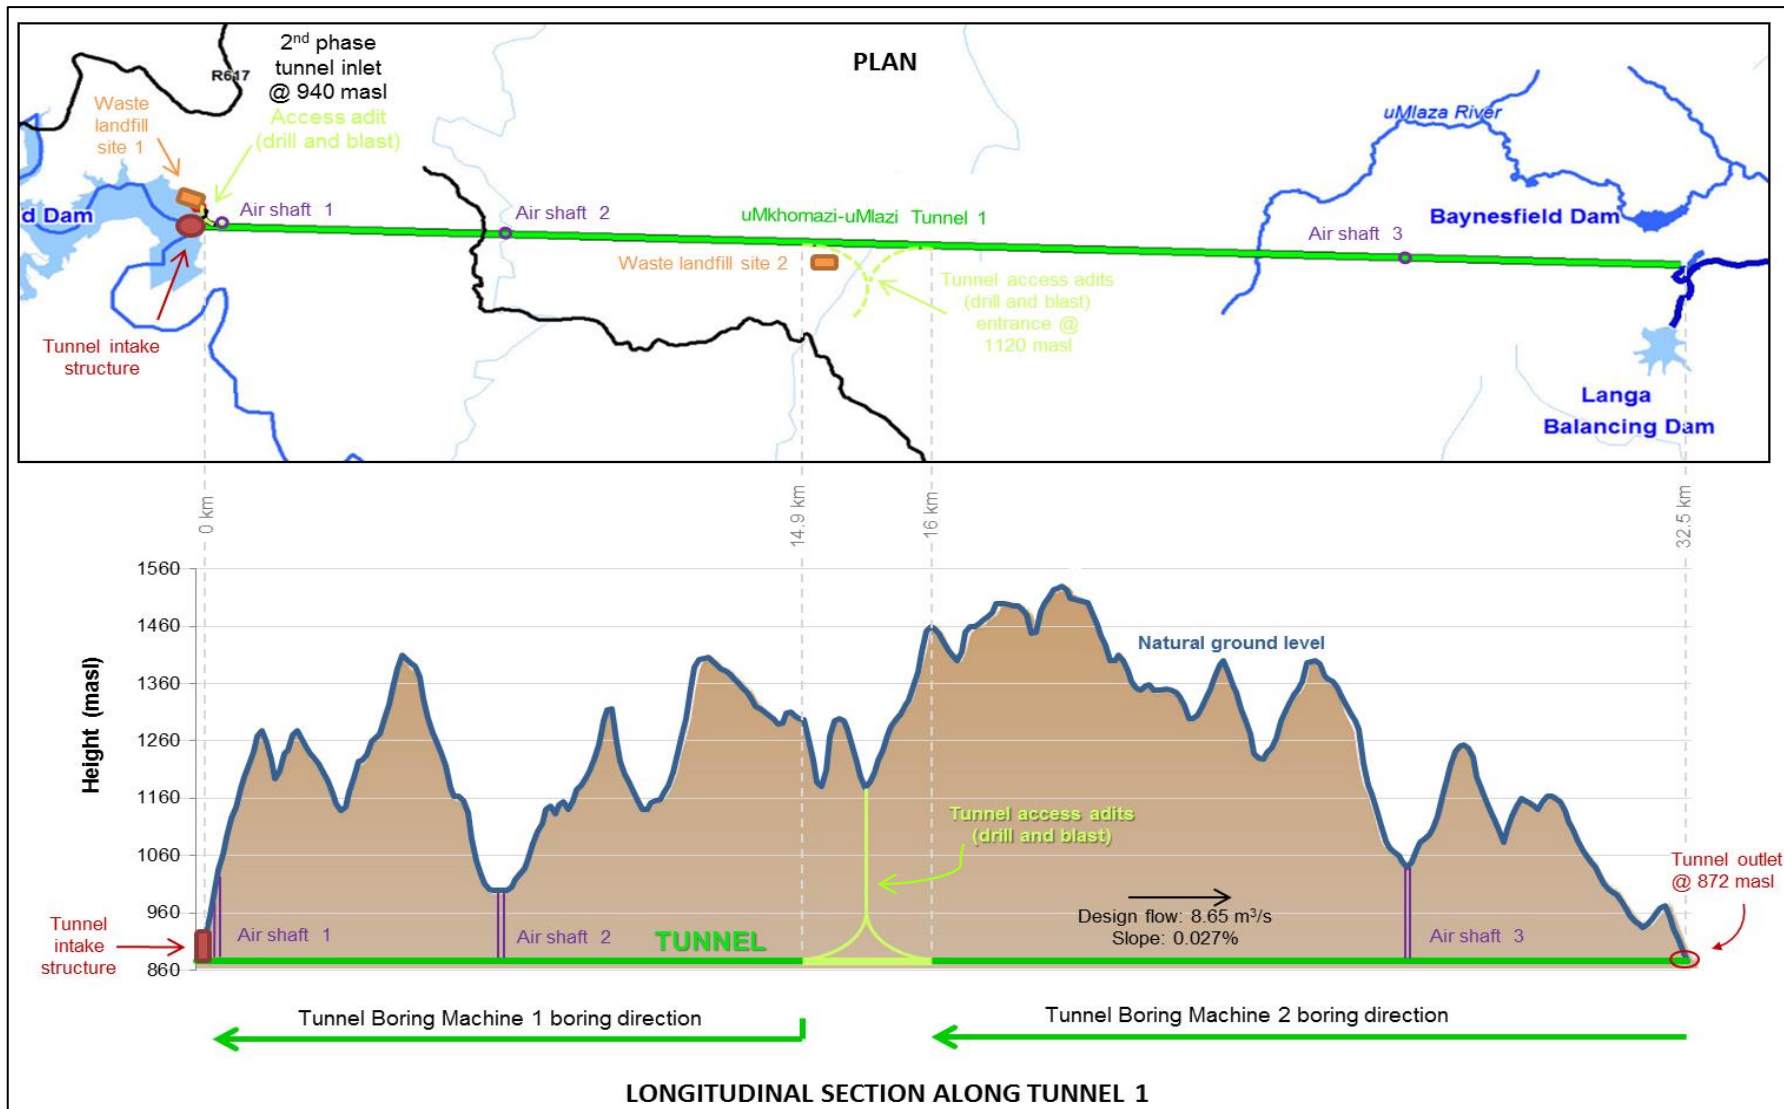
uMkhomazi-uMlaza tunnel plan and longitudinal alignment
